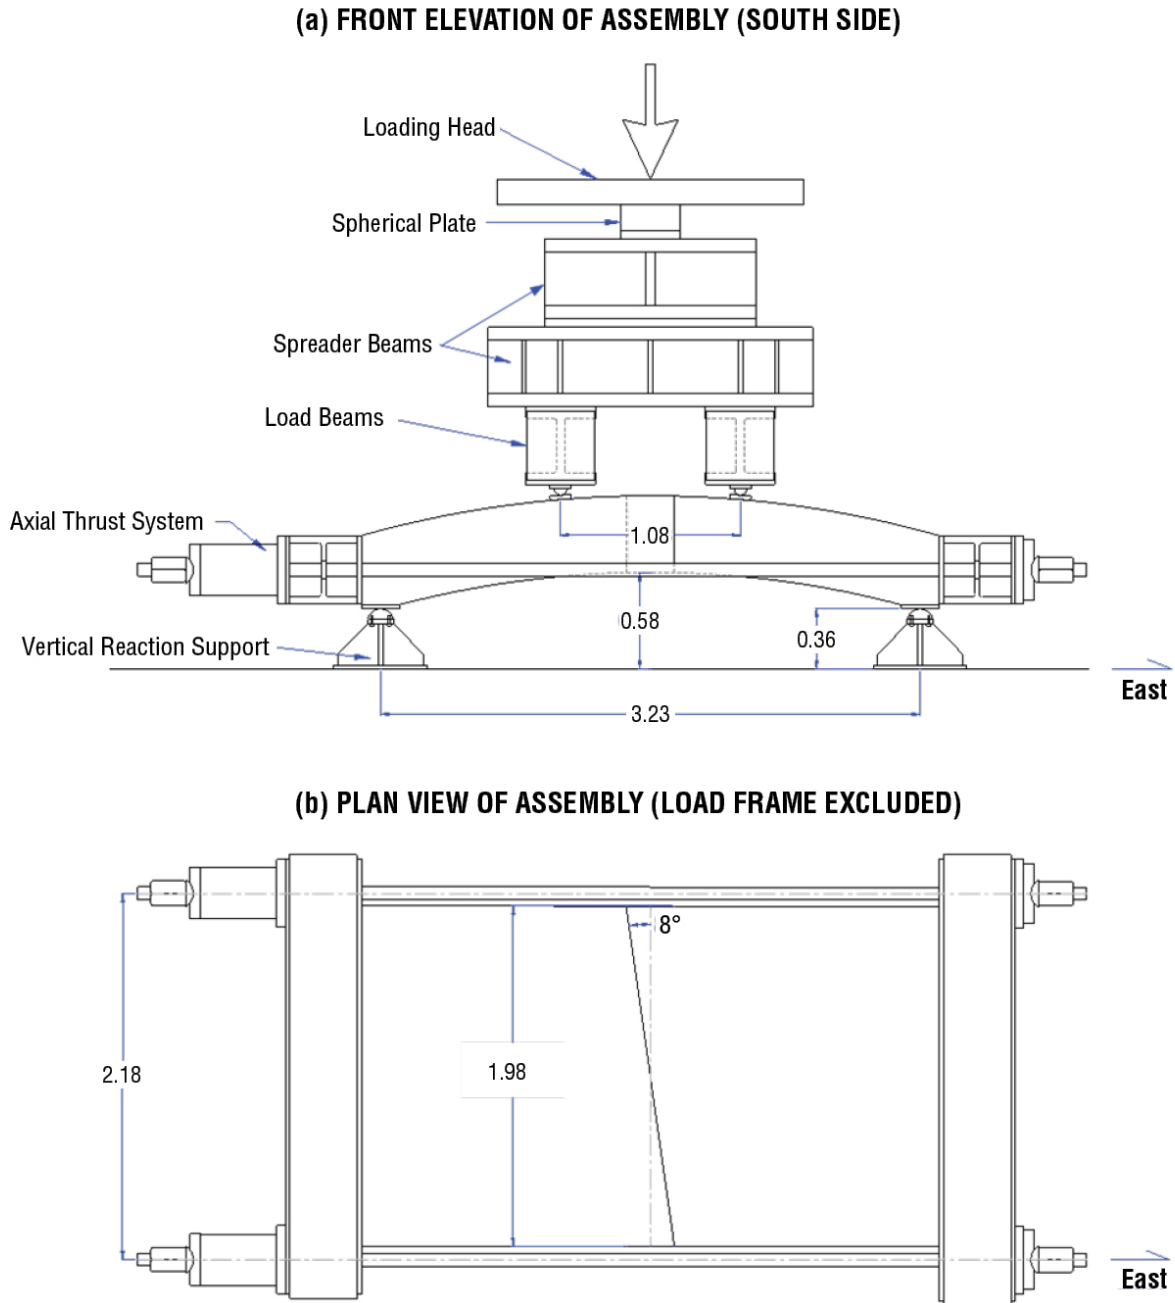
(a) Elevation view and (b) plan view of test configuration (units: m)
